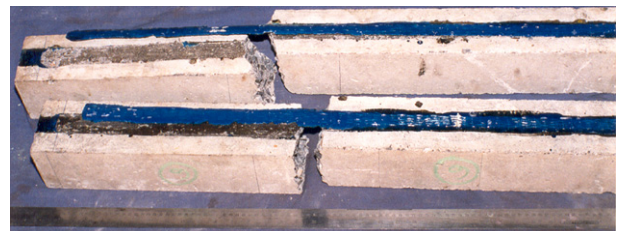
Debonding in one of the broken parts of the beam due to shear failure.
